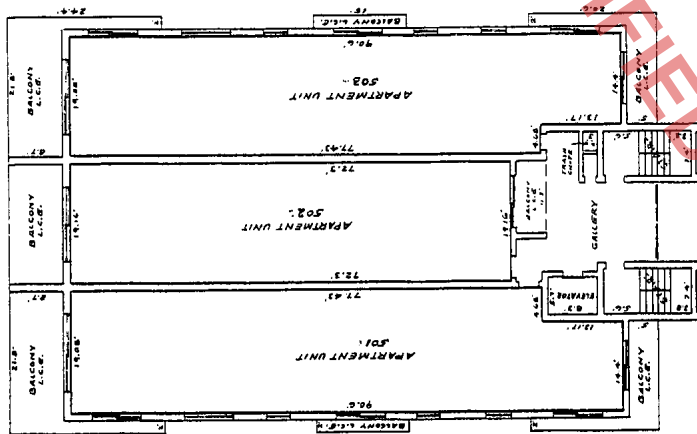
EXHIBIT "A" PAGE 2 (FLOOR PLAN)
